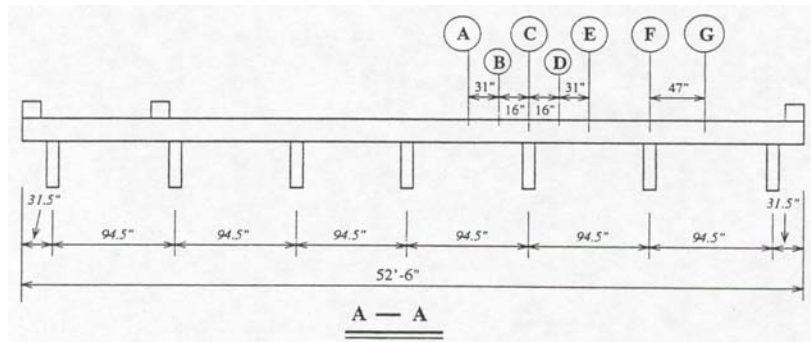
Plan View of Transverse Gage Lines (from Cao et al., 1994)
